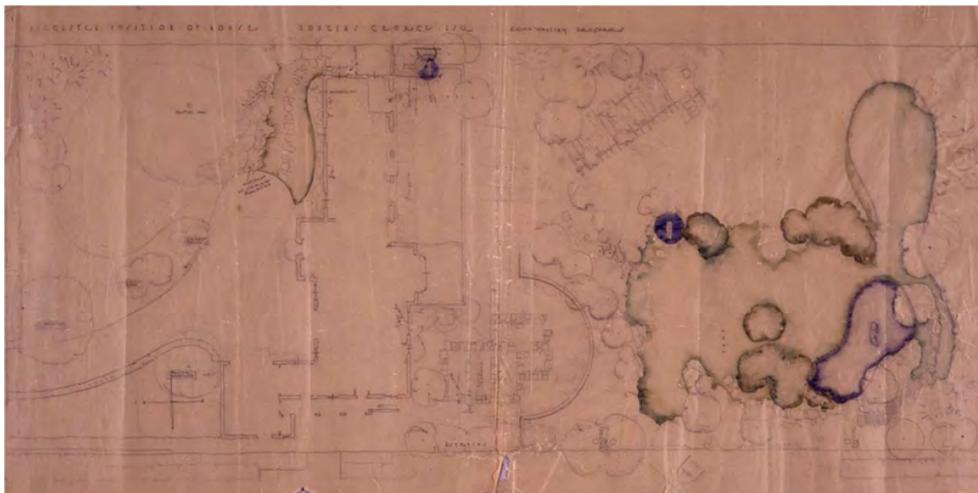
Edna Walling's design for the 'Silver Birches' garden for Douglas George, Yarrbat Avenue, Balwyn, 1936. (Source: Walling 1936, SLV)
